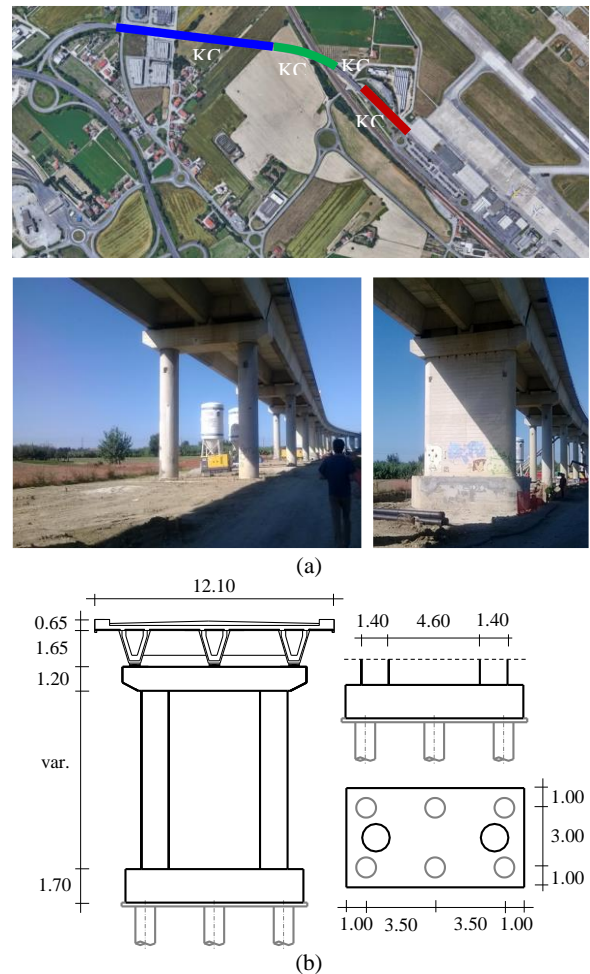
(a) Plan location of KCs and view of the viaduct, (b) pier elevation and foundations in [m].
